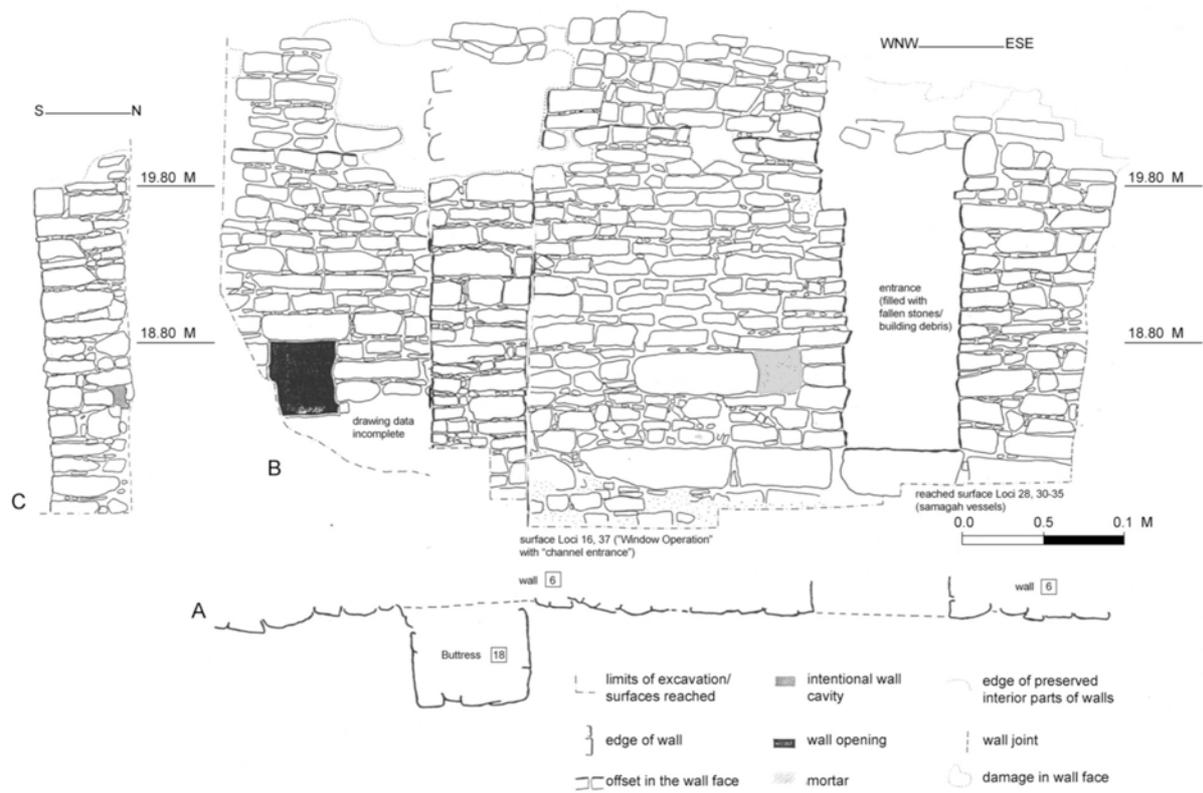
Area B, Building Unit B VIII. Elevation of the northern wall of Room 2.
